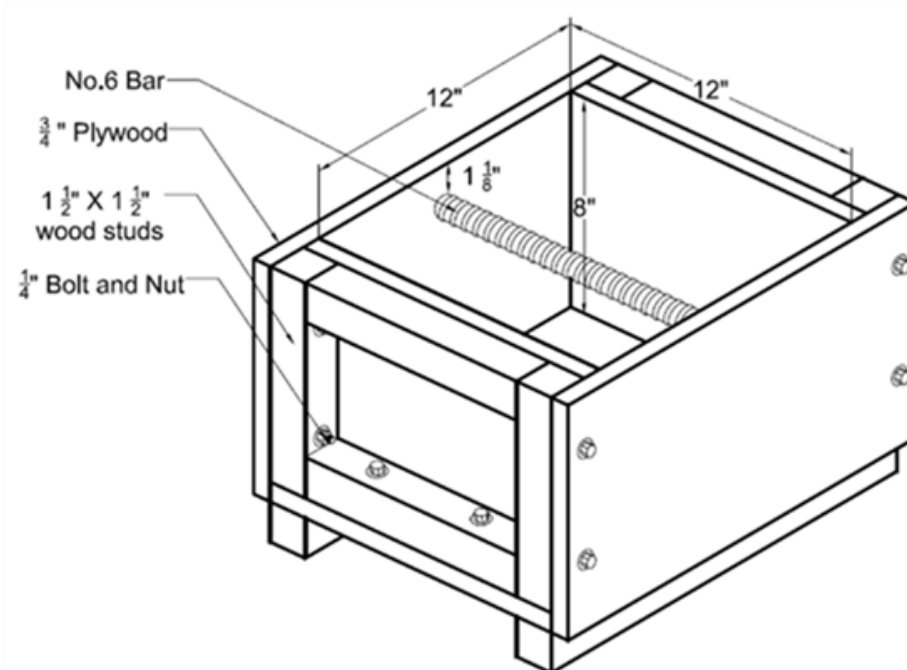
Settlement cracking mold (Al-Qassag et al. 2015)
